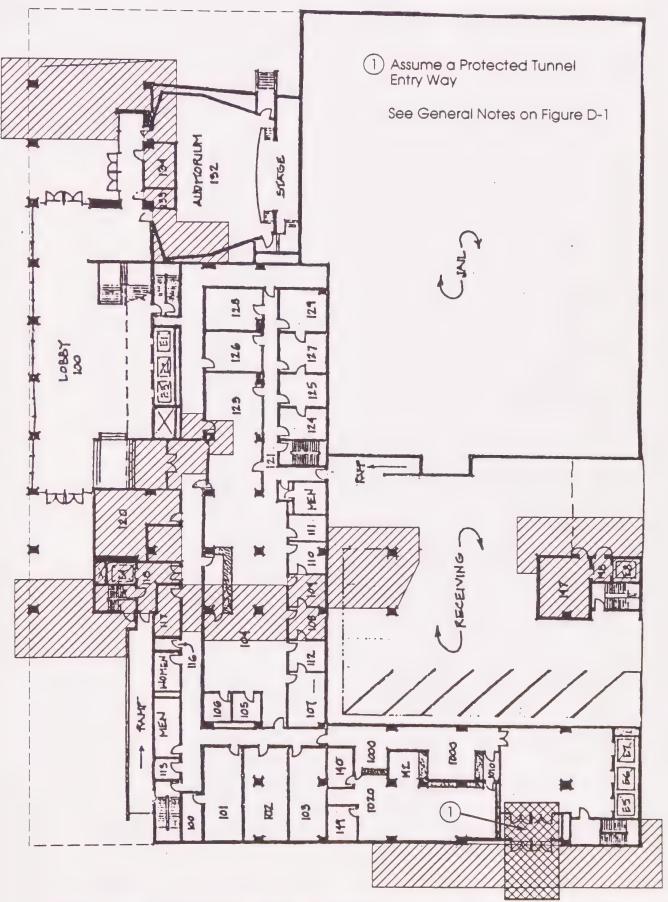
1st Floor Plan Showing Areas Impacted by Construction
